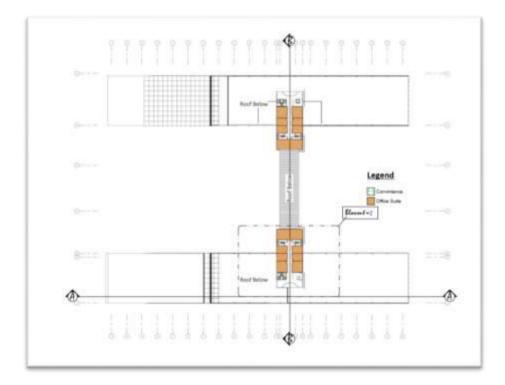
Proposed second floor plan Source: Researcher's design proposal, (2020)
